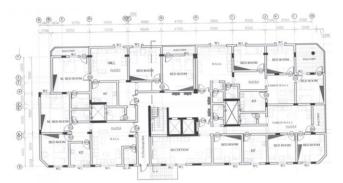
Plan belonging to an apartment type house in Sudan (Khartoum)
